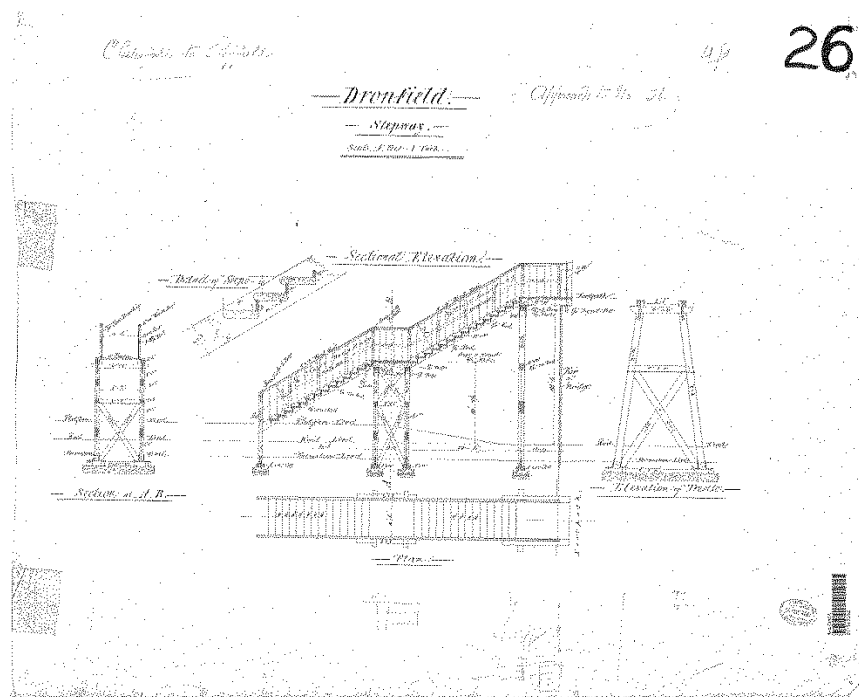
Drawing of steps from Lea Road Bridge to the Sheffield Platform dated 1880
